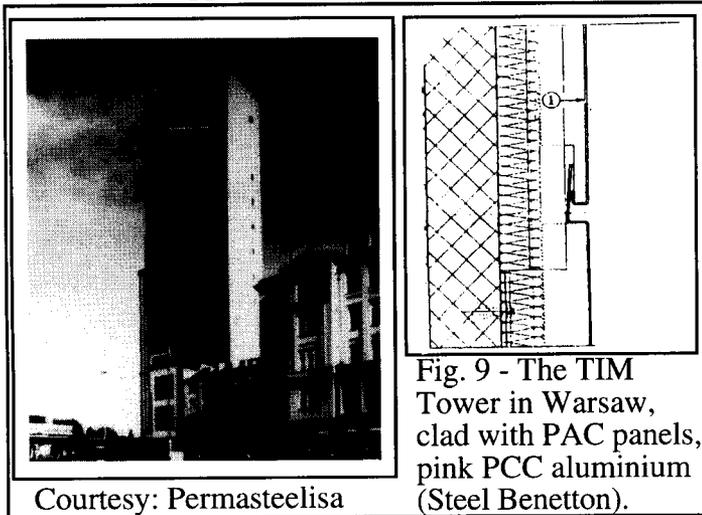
The TIM Tower in Warsaw, clad with PAC panels, pink PCC aluminium (Steel Benetton).
